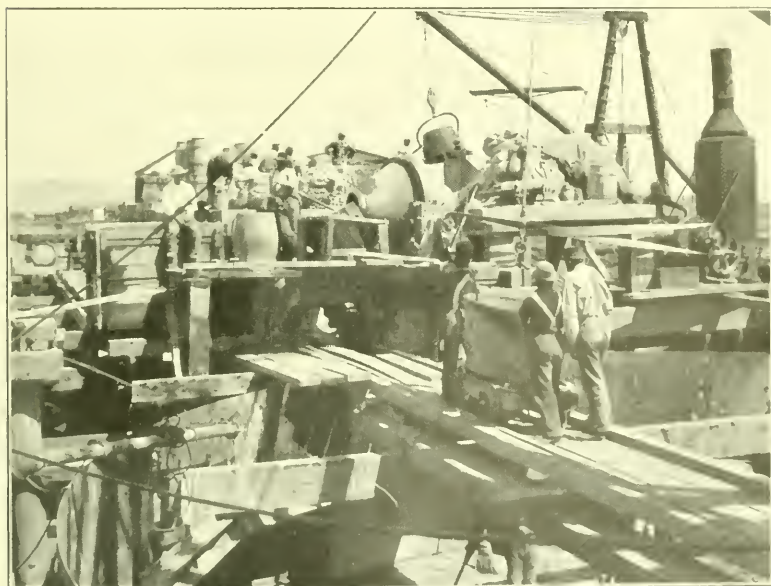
PLACING CONCRETE IN PIVOT PIER, DUMBARTON POINT DRAW
